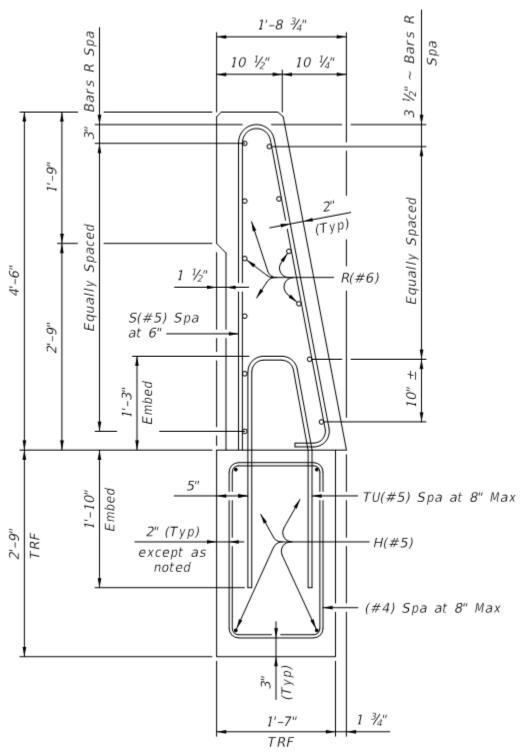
Reinforcement Details of Single Slope Barrier with TRF Concrete Beam Foundation.
